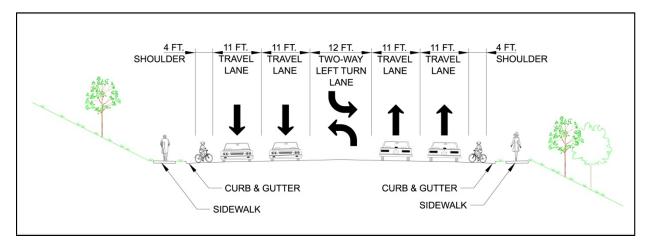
SECTION 1 EAST CENTER STREET TO WEST OF HAWTHORNE STREET
